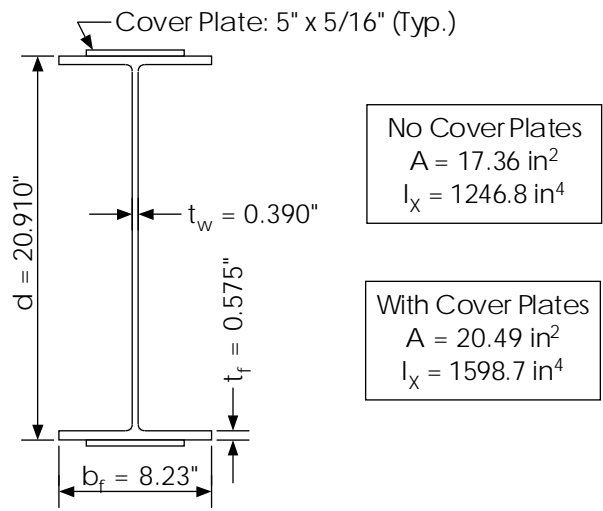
Girder Cross Section, Showing the Nominal Dimensions and Section Properties
